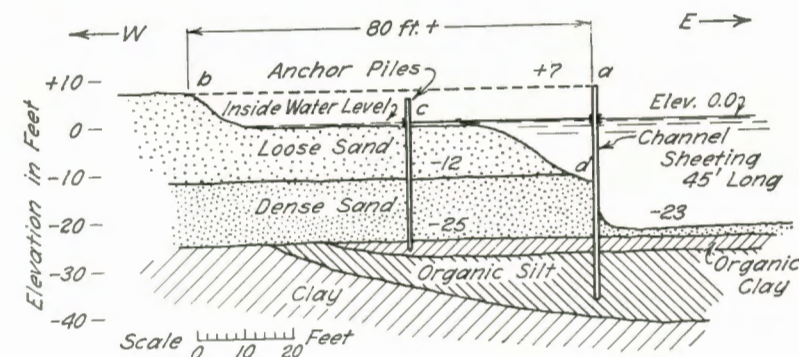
CONDITIONS PRIOR TO THE SLIDE: CROSS-SECTION THROUGH DOCK WALL
